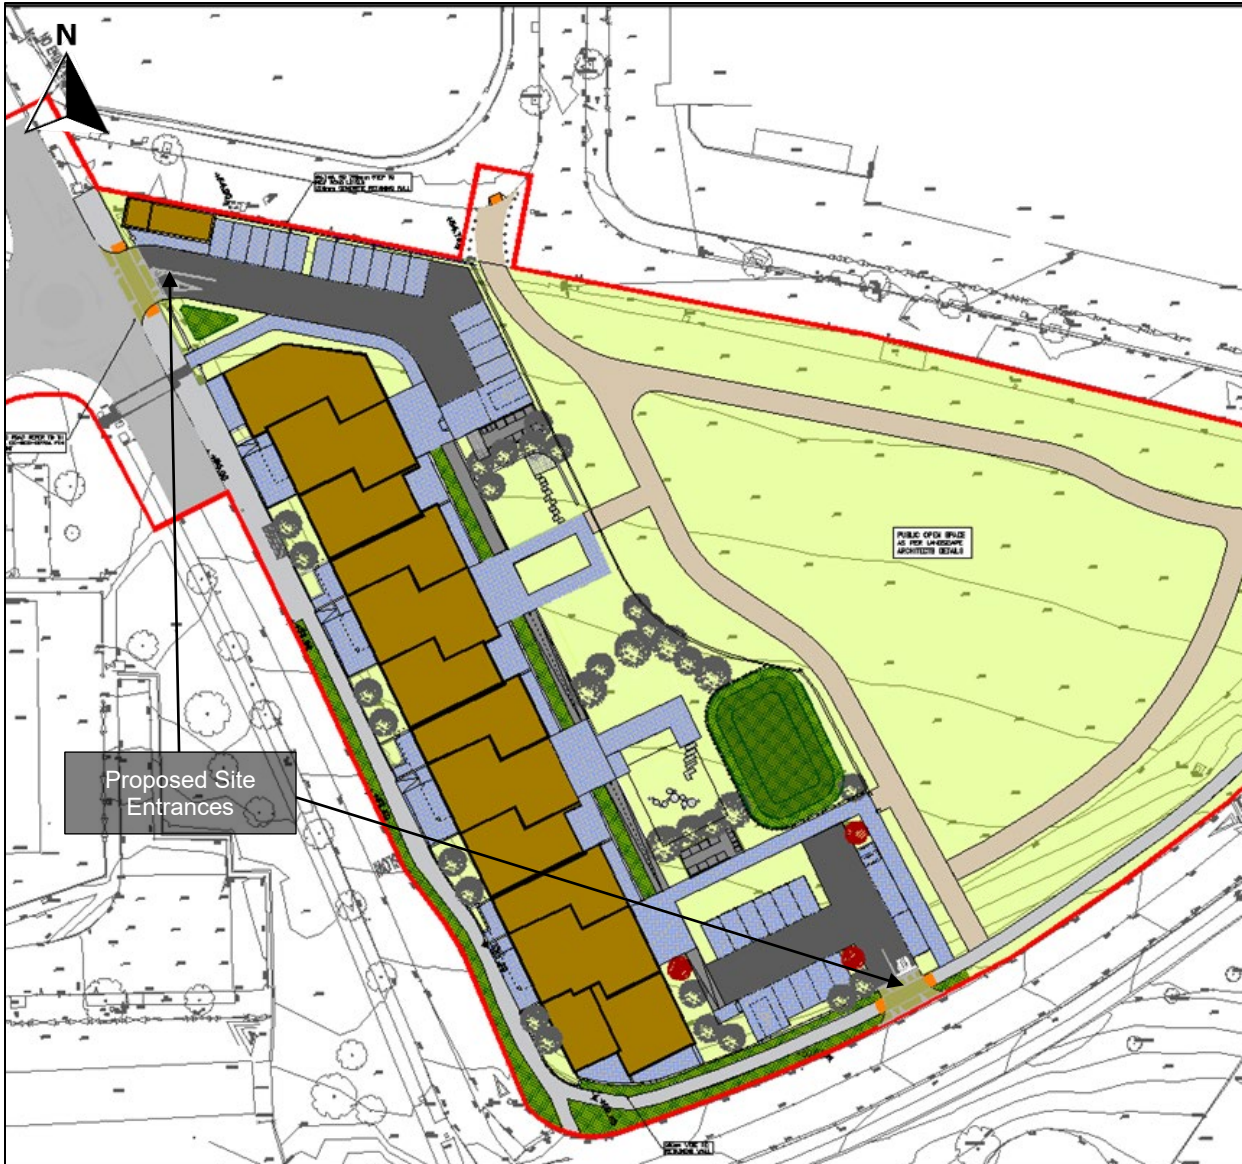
Site Plan (Cropped) (A refinement of this site layout may be circulated by the architect)
